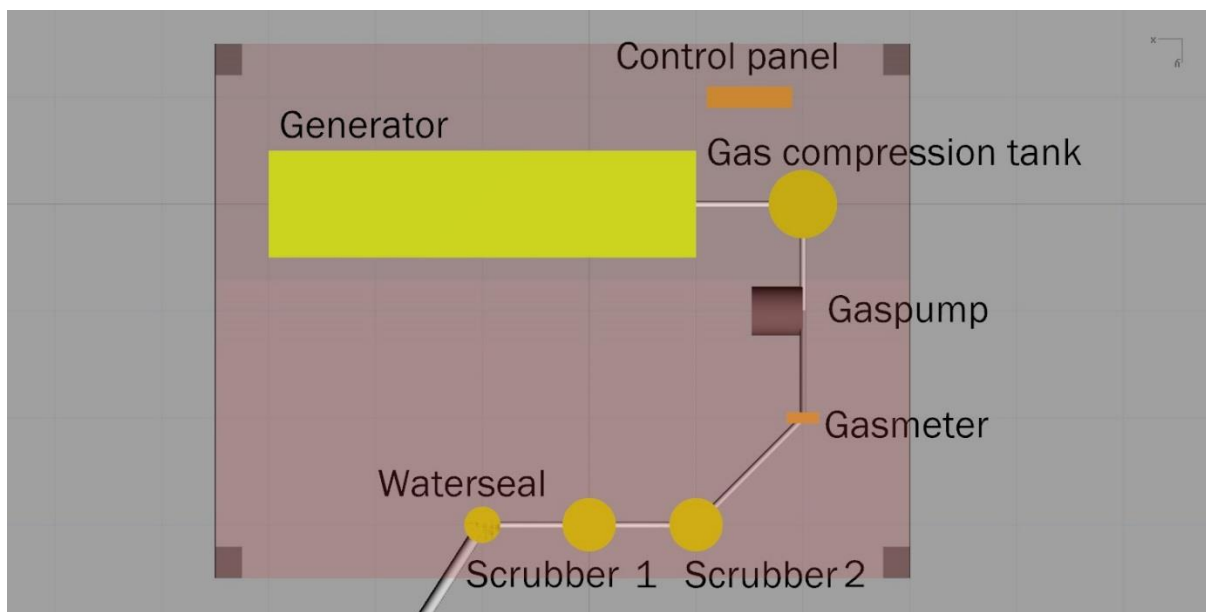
TOP VIEW GAS TREATMENT & GENERATOR HOUSING
